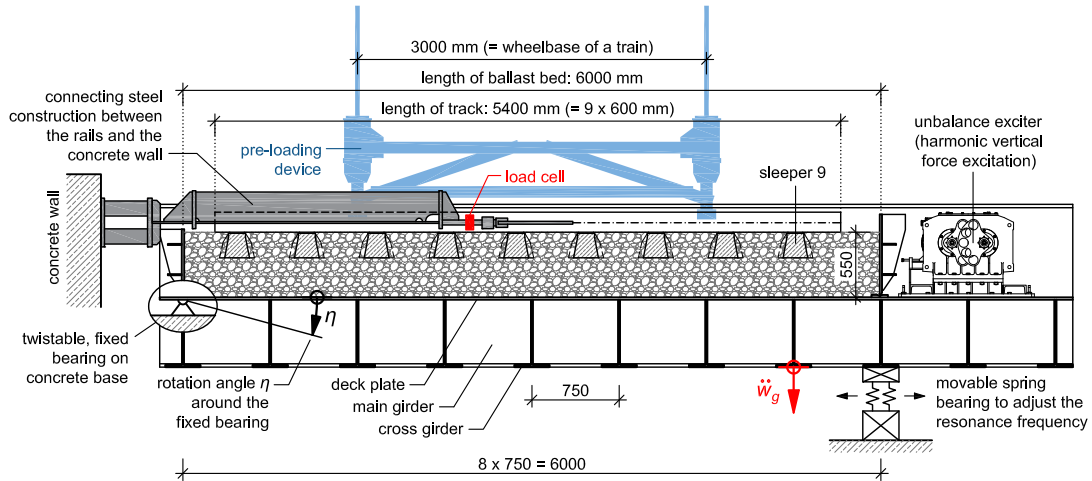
Longitudinal section of the test facility (Source: A. Stollwitzer)
